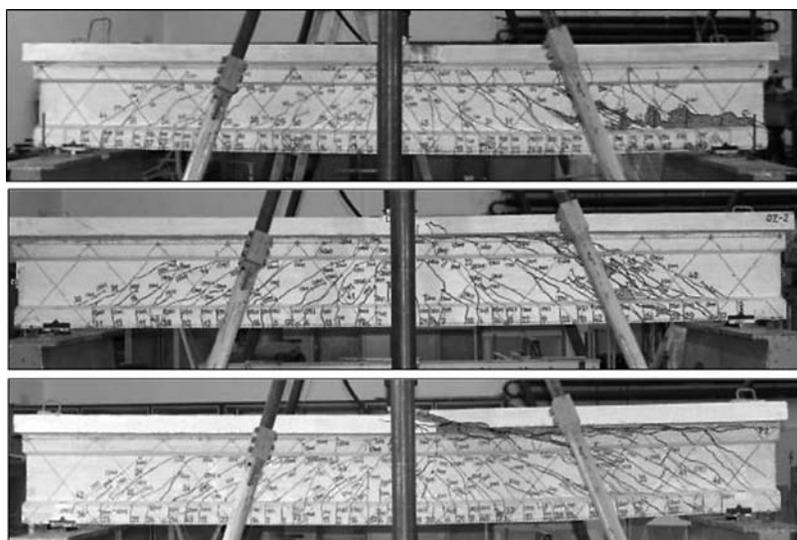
Shear failure. From the top: beam ST1 – failure of the web, beam Z2 – combination of failure web/contact, and beam D2 – failure in the contact gap
